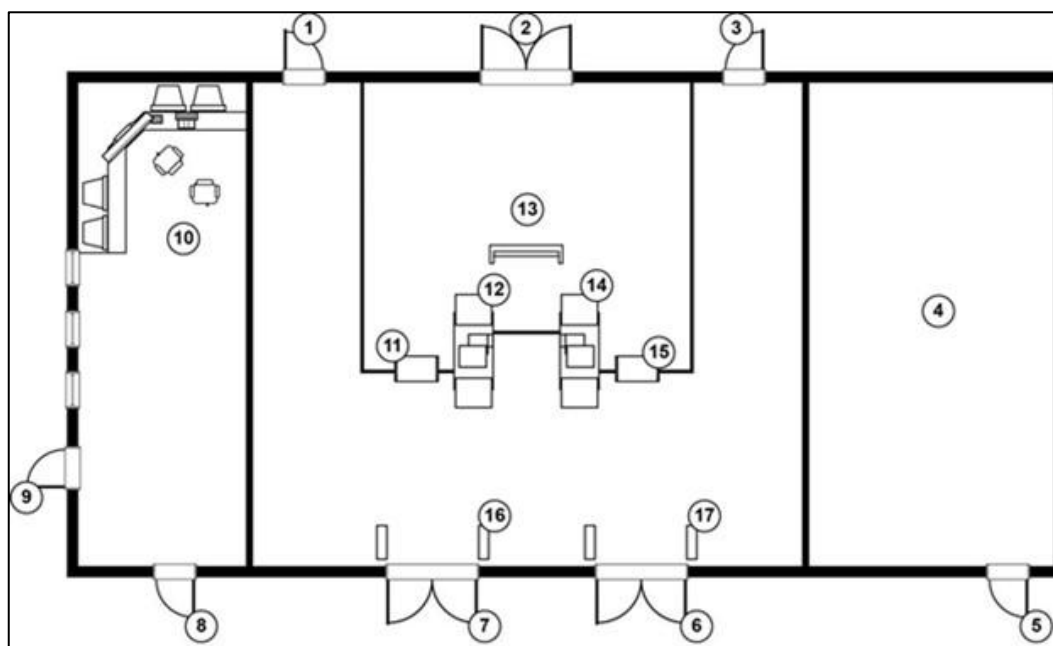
Layout of the Access Control Building of the Protected Zone:
